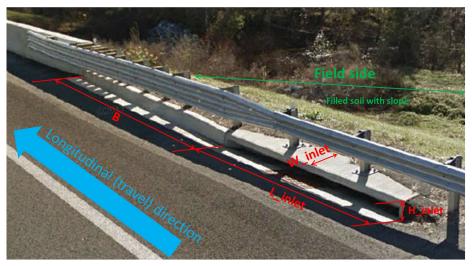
Key Parameters for Placing Storm Drain Inlet.
